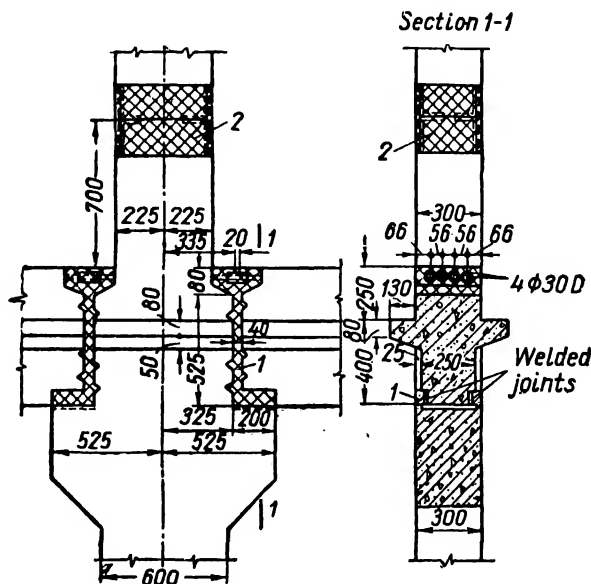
, g. Form-weld of jointing bars in a column-girder joint
